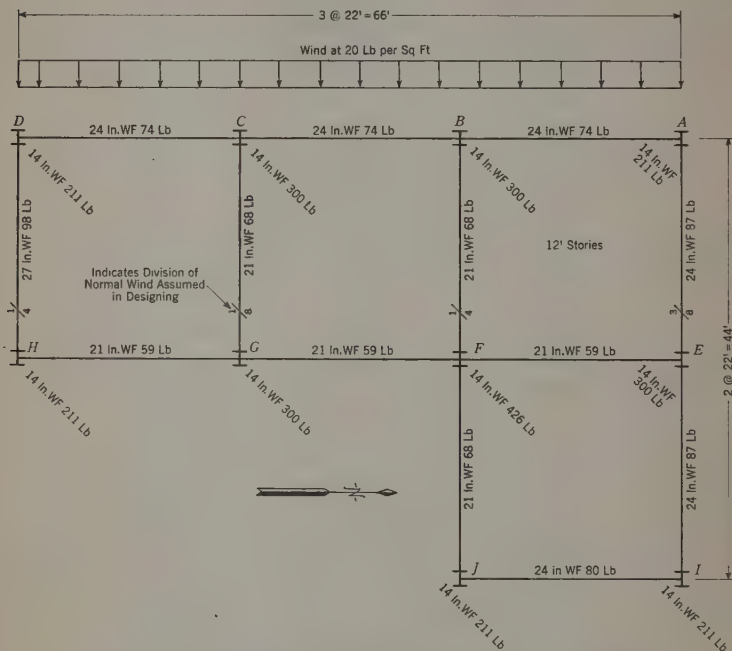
COLUMN AND GIRDER SECTIONS AT FIRST FLOOR OF TWENTY-SIX-STORY EXPERIMENTAL BUILDING FRAME
